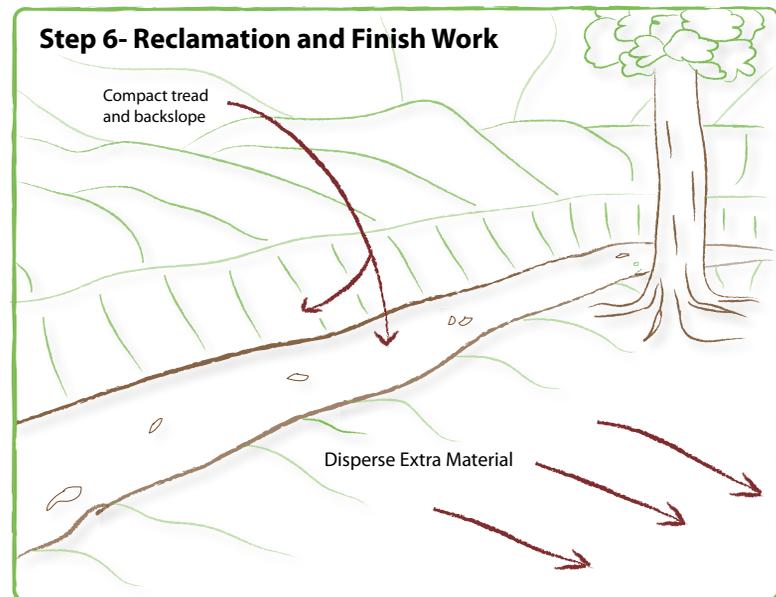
After the final step of trail building, the trail should appear as if it has always been there.
